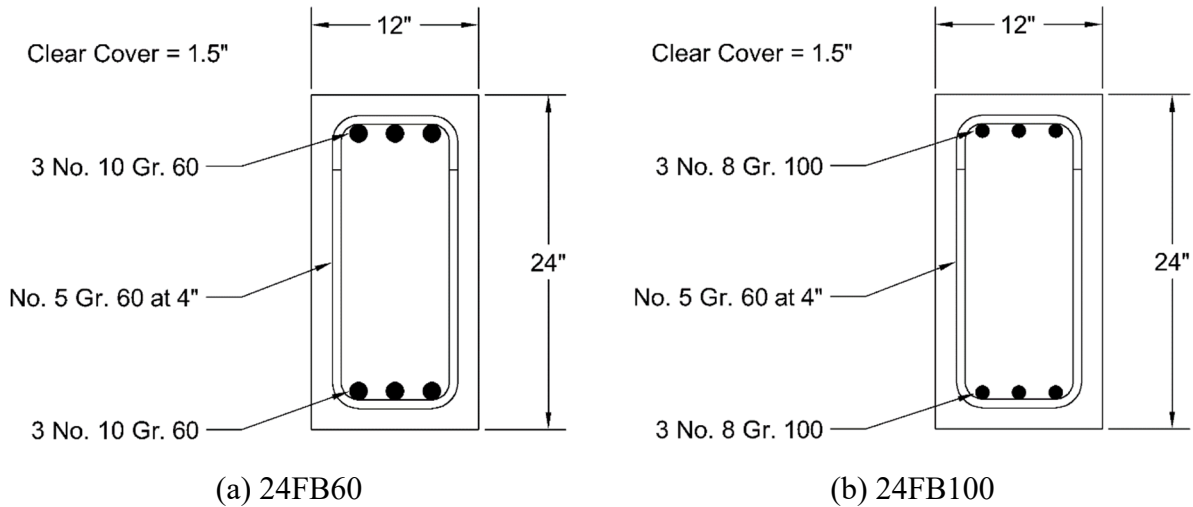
Height to span ratio = 1/12 beam cross sections
